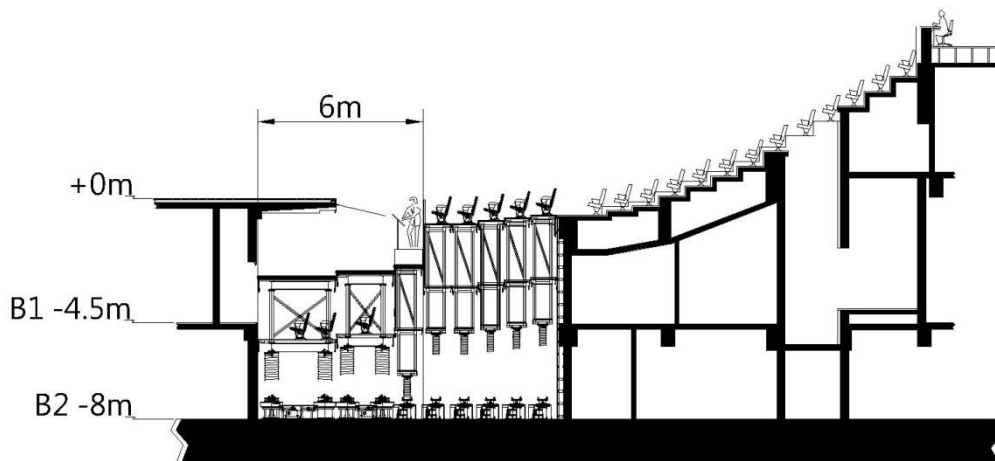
Orchestra Pit Elevation Platform Section
